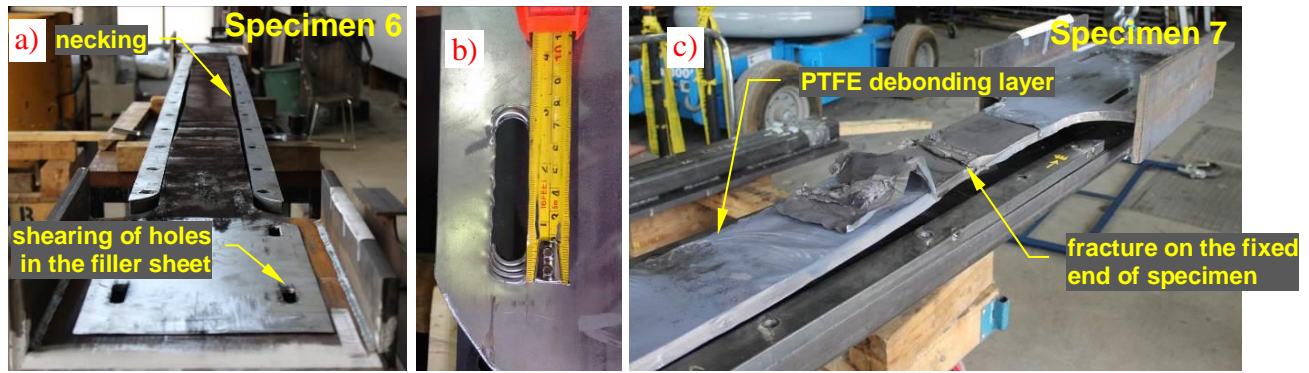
a) Deformed shape of Specimen 6 at the end of test; b) Shearing of standard hole in the end filler sheet of Specimen 6; and c) Fractured core of Specimen 7 under FF seismic loading.
